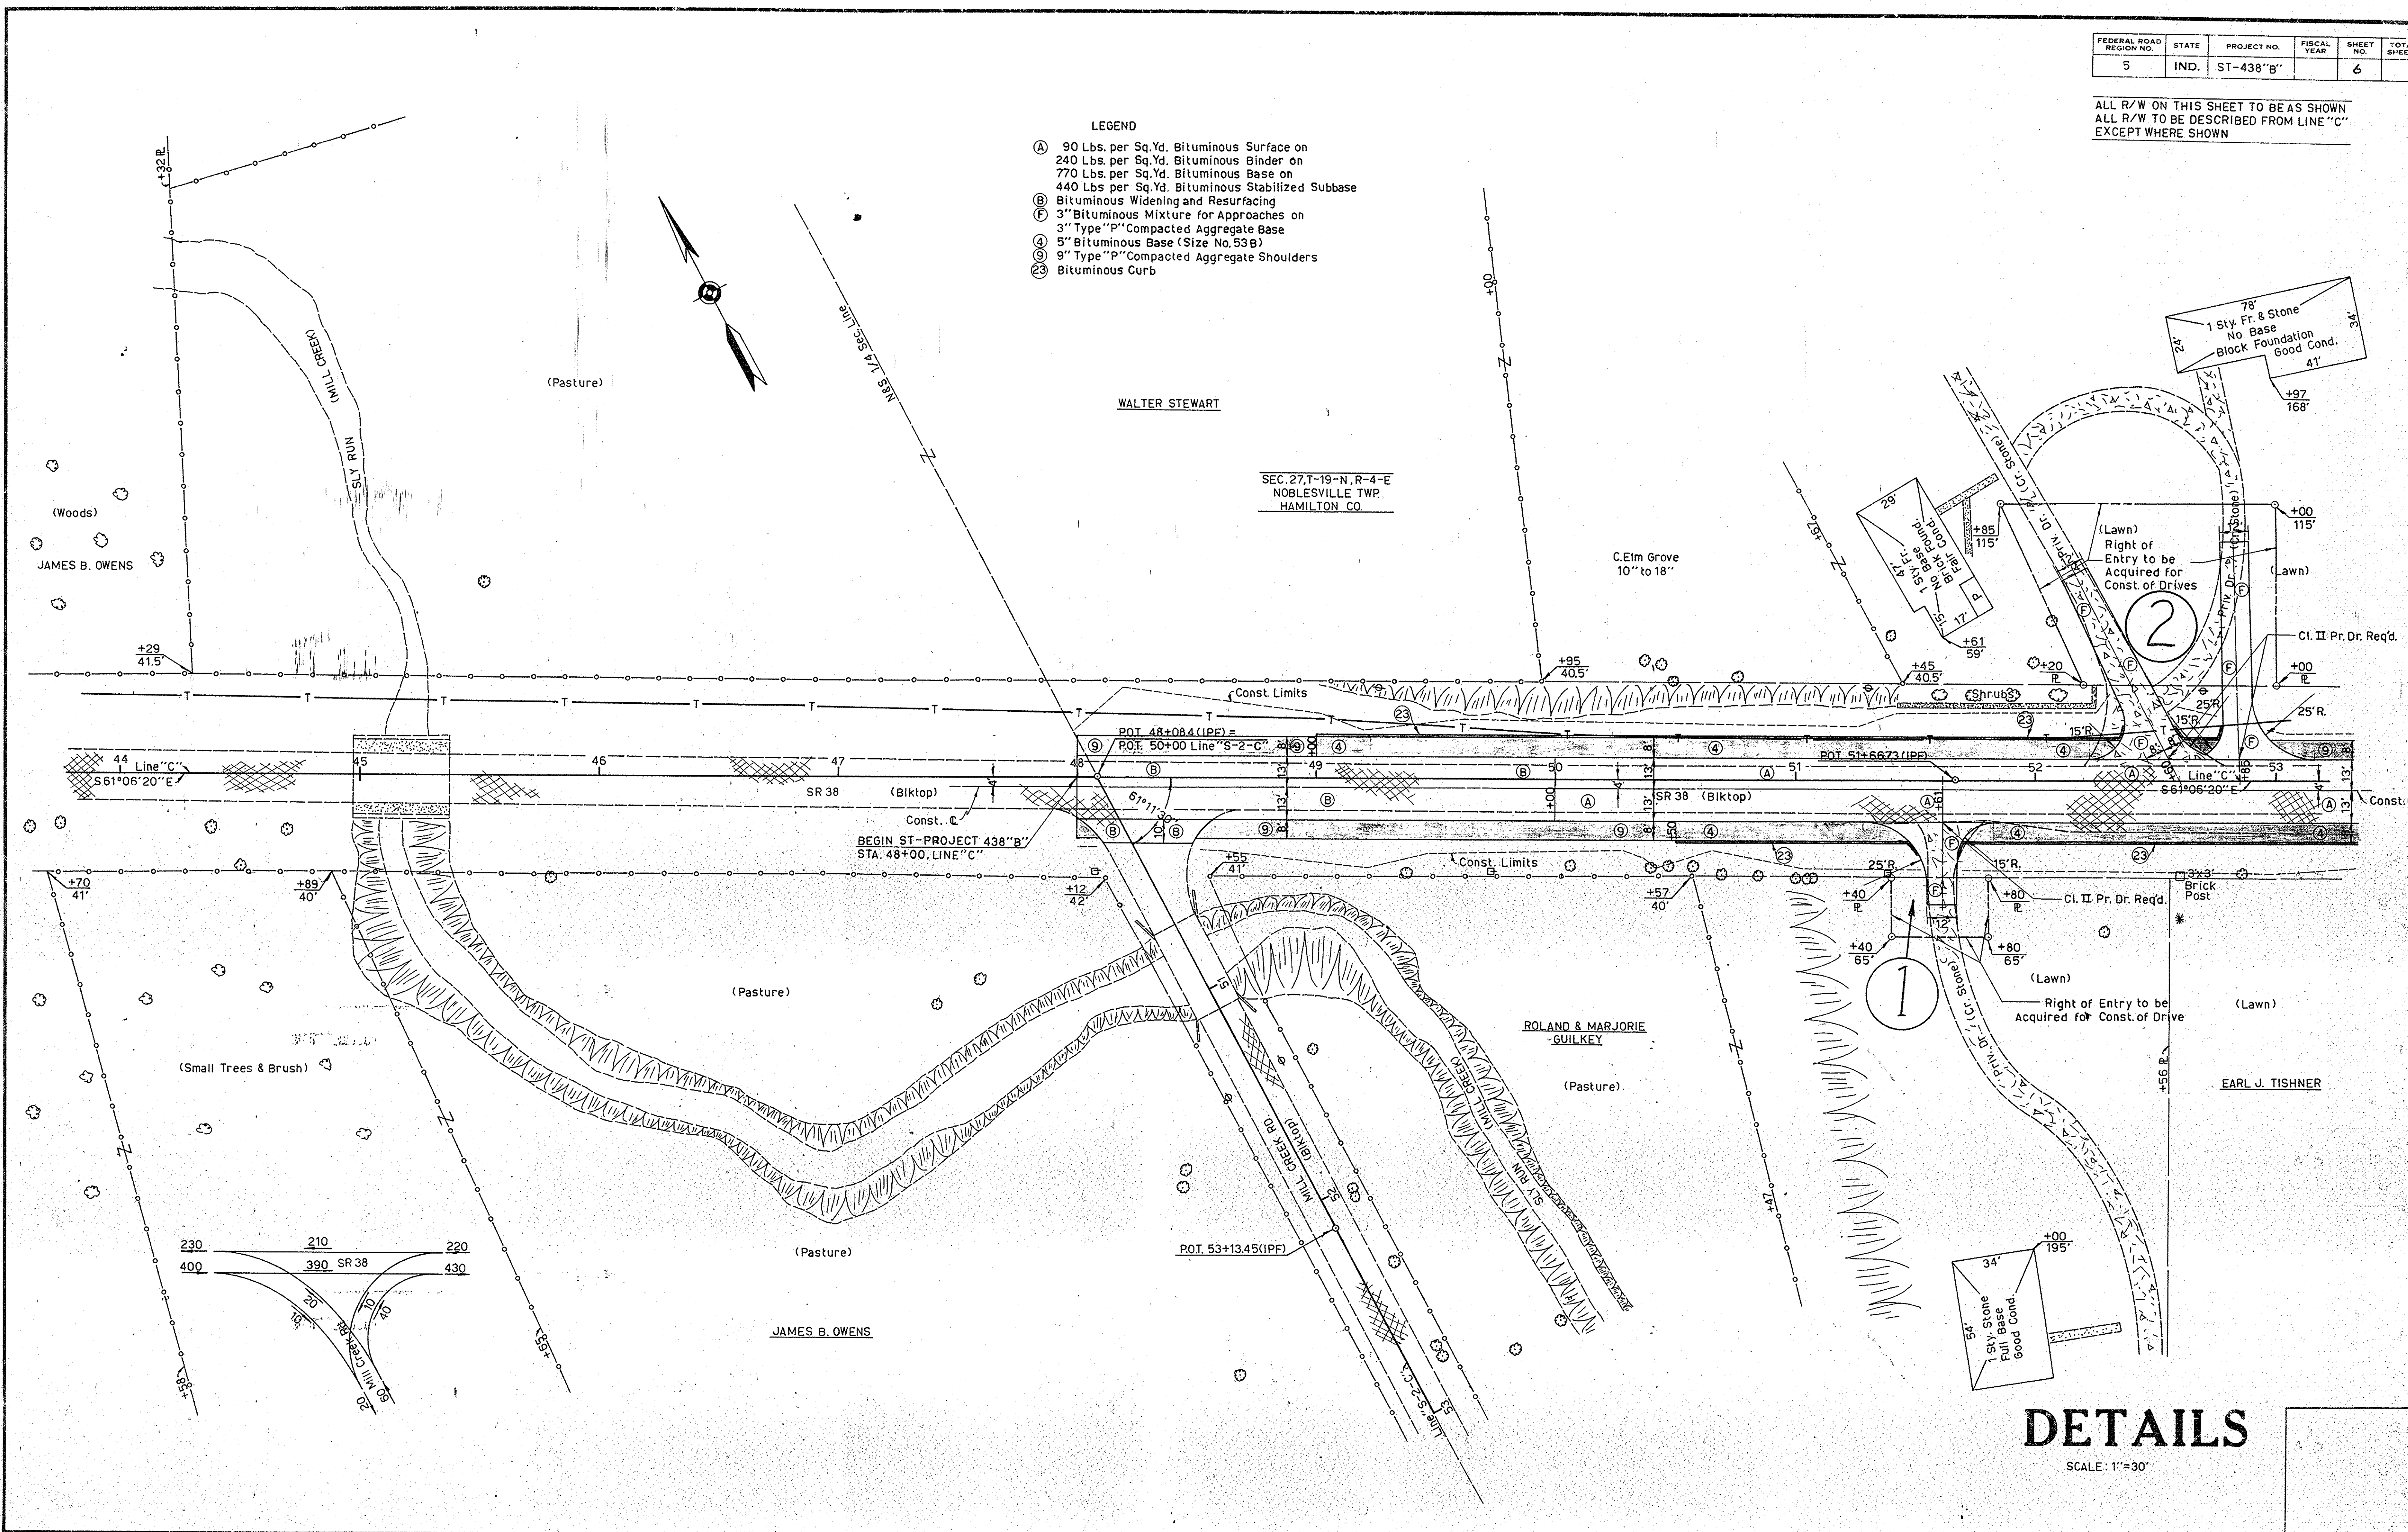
PLAN - PROFILE B. R. R. STANDARD
